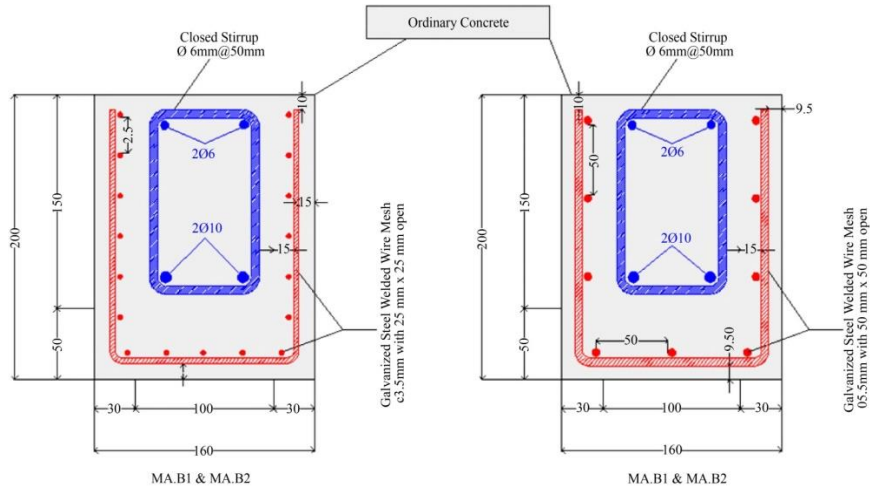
Monolithic beams cross section (mm) (Maraq et al., 2021)
